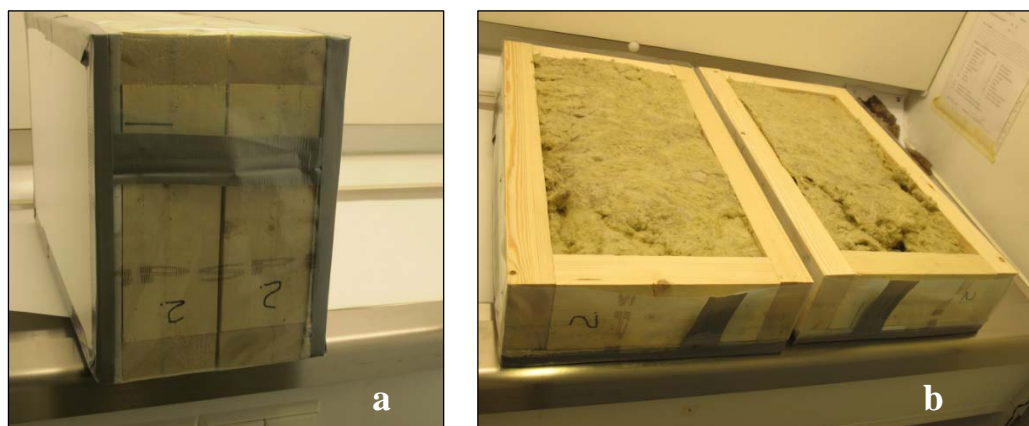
Timber frame test element for mould growth after contamination and assembly. b. Timber frame test element after disassemble for mould growth assessment.
